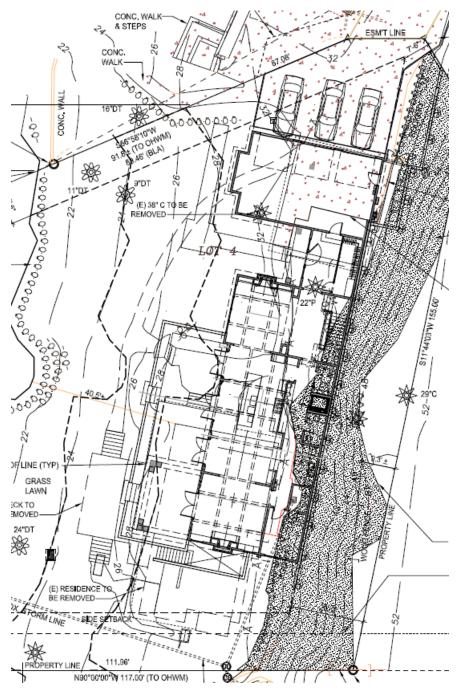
Excerpt from proposed plans showing layout for new home. The garage replacing the carport is about 15' wider than the original. The new house shifts about 10' to the east and is continuous with the garage.
